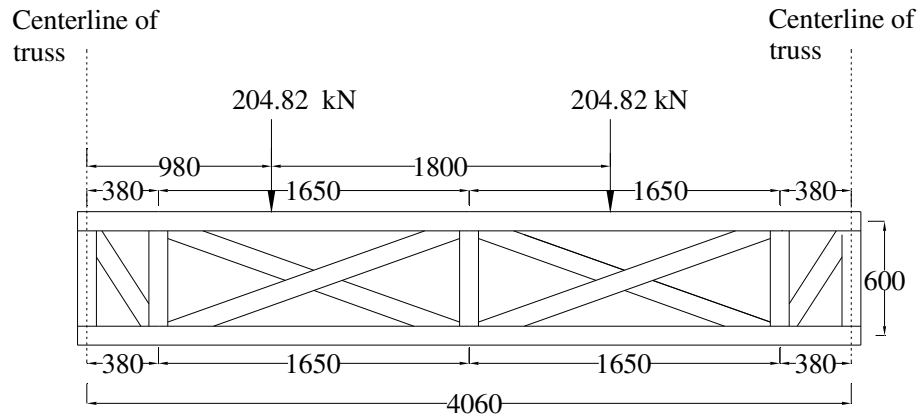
Factored tandem load with impact on floor beam at closest position to truss
